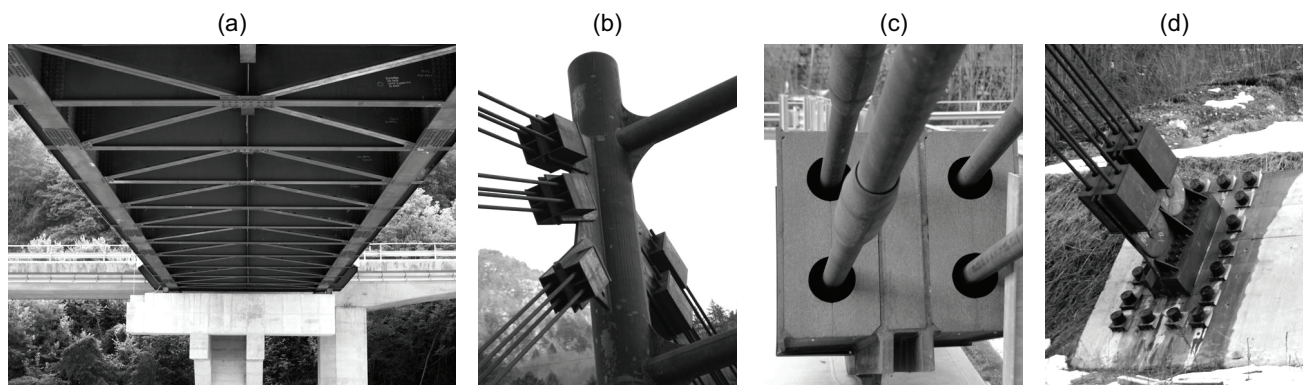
Construction details: (a) steel bracings and support on the RC pier (NR n.13 side); (b) stays-tower connection; (c) stays-deck connection; (d) stays-RC foundation connection.
